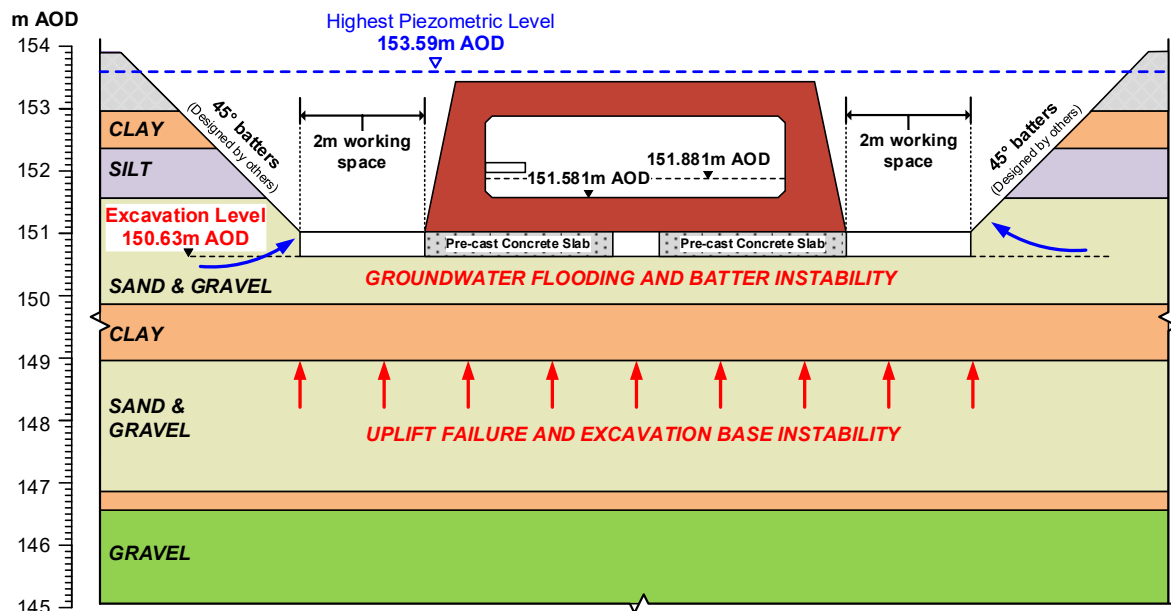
Conceptual model drawing showing the geology, groundwater level and culvert construction details.
